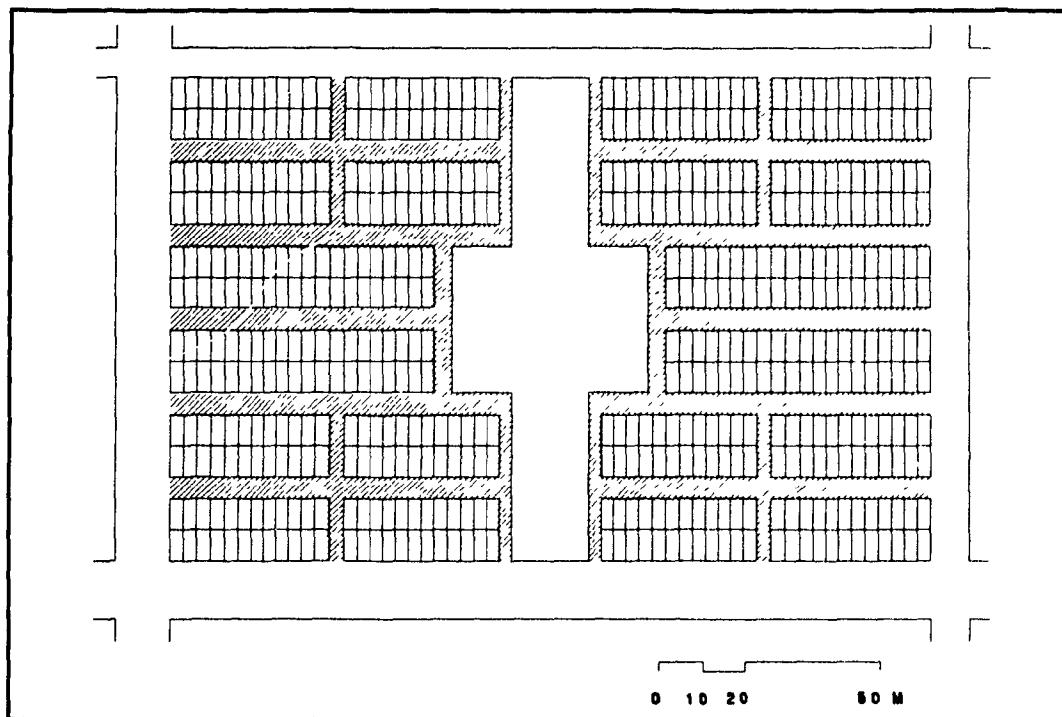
STREET PAVING - CONTROL PLAN
